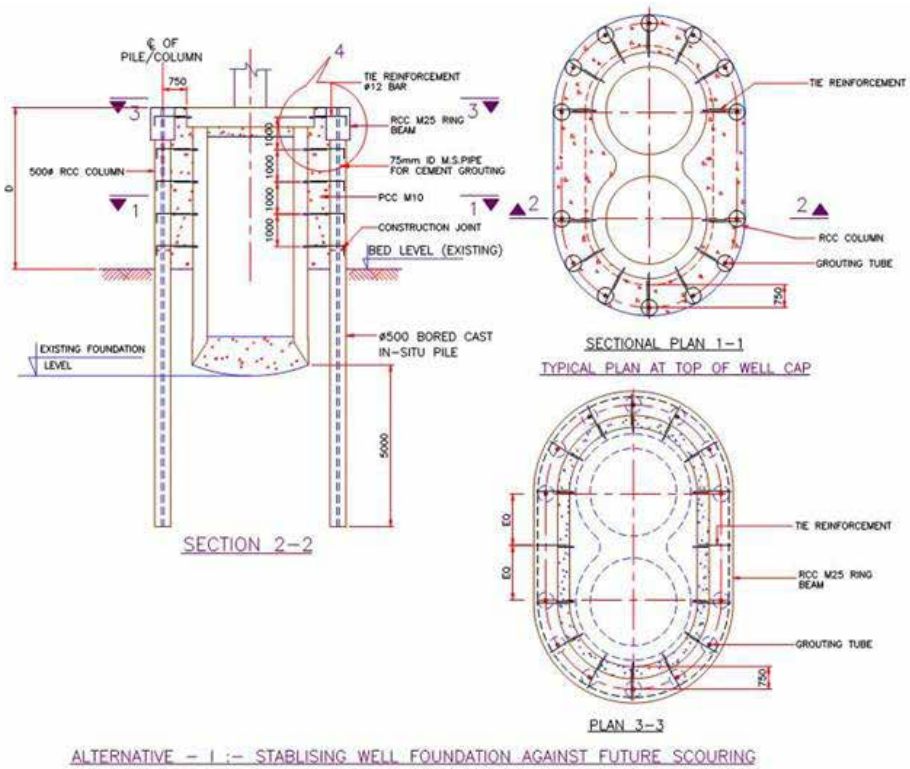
STRENGTHENING OF WELL FOUNDATION
